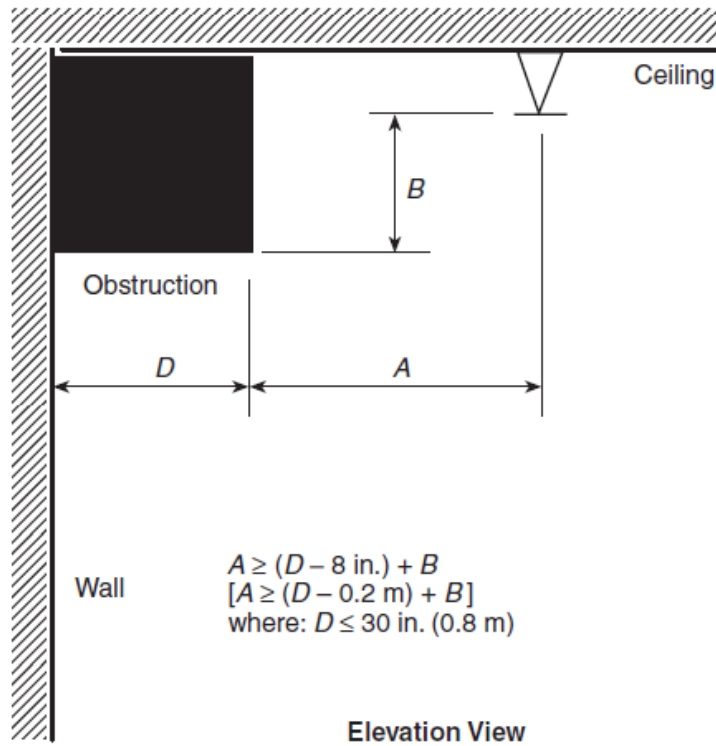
(b) Obstructions Against Walls (Extended Coverage Upright and Pendent Spray Sprinklers).
